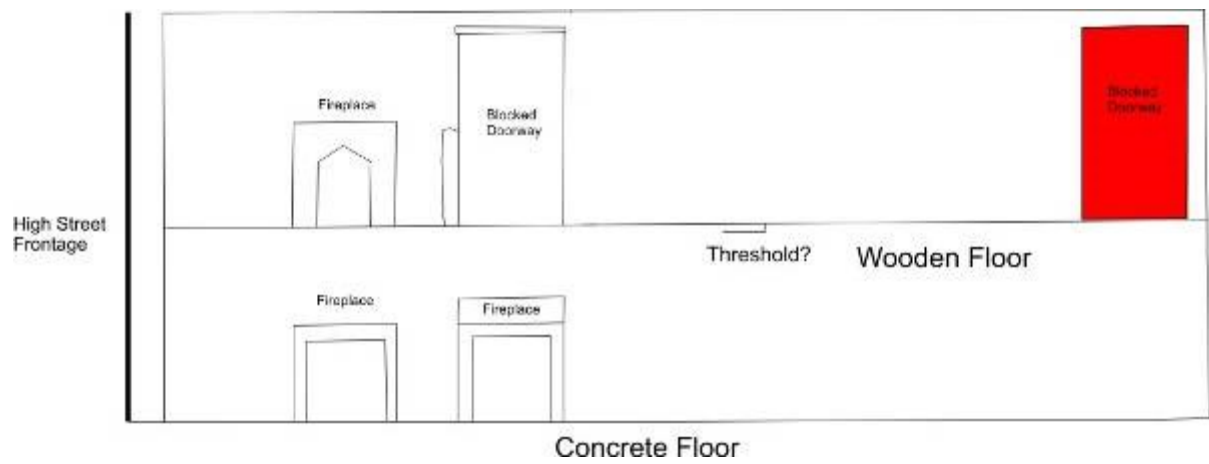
Location of further blocked doorway in Southern elevation of Room 5 at first floor level Scale 1:50
